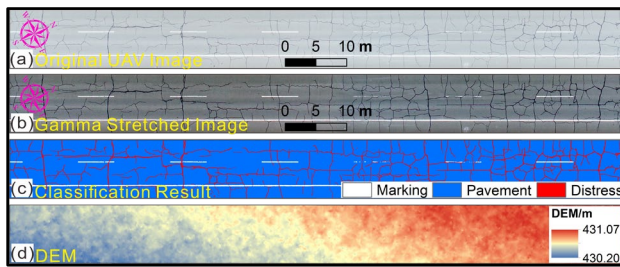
Classification results of pavement cracks in the typical section of 2011 km-300 m~400 m.
